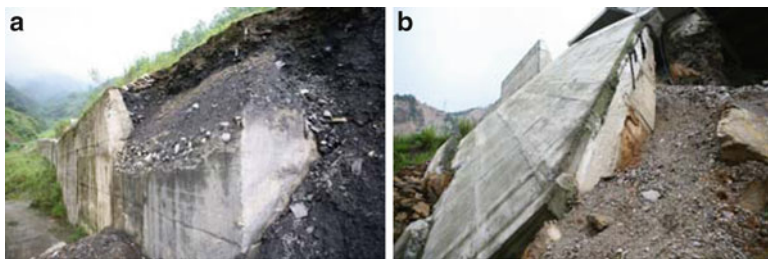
Failures of concrete retaining wall along the Dujiangyan-Yingxiu expressway. (a) Poor aggregate. (b) Unstable foundation
